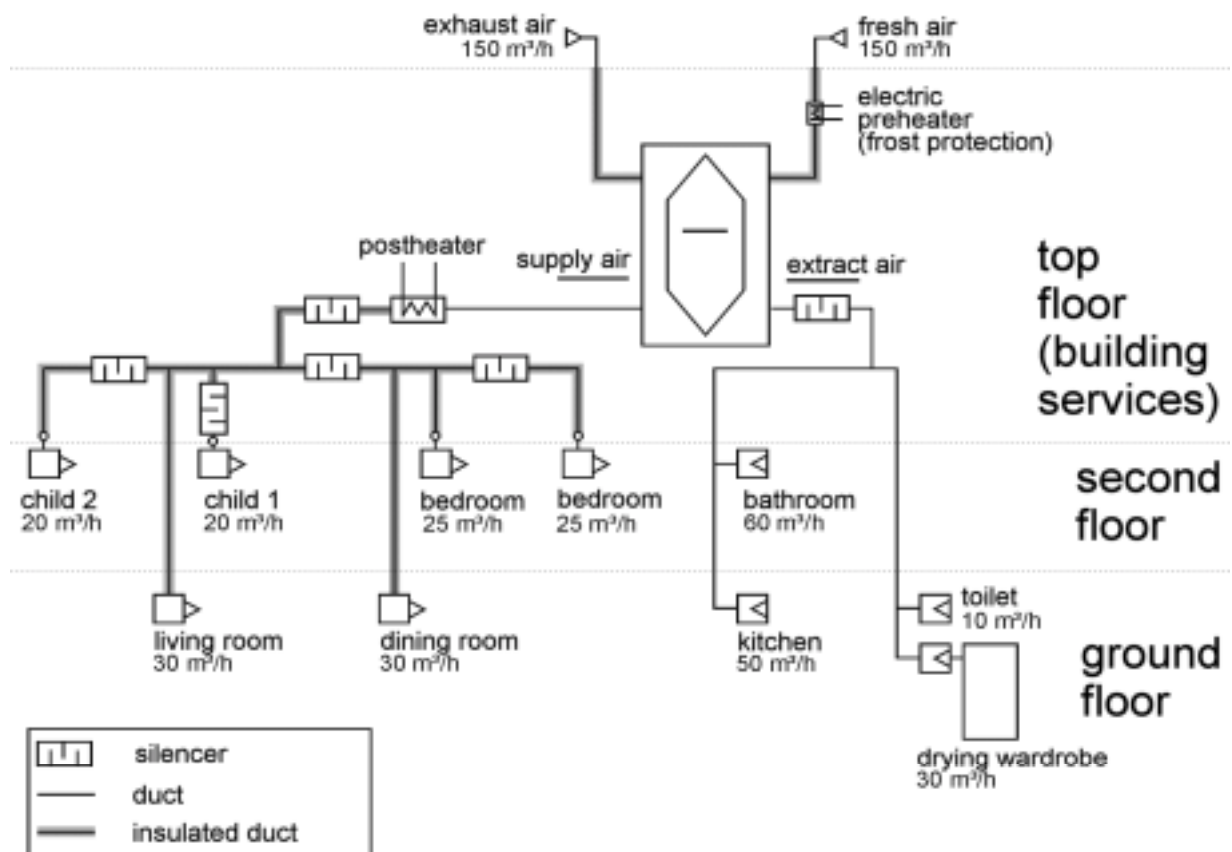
Ventilation system duct network plan for Passive House type „Jangster de LUX“ with the design layout flow volumes
